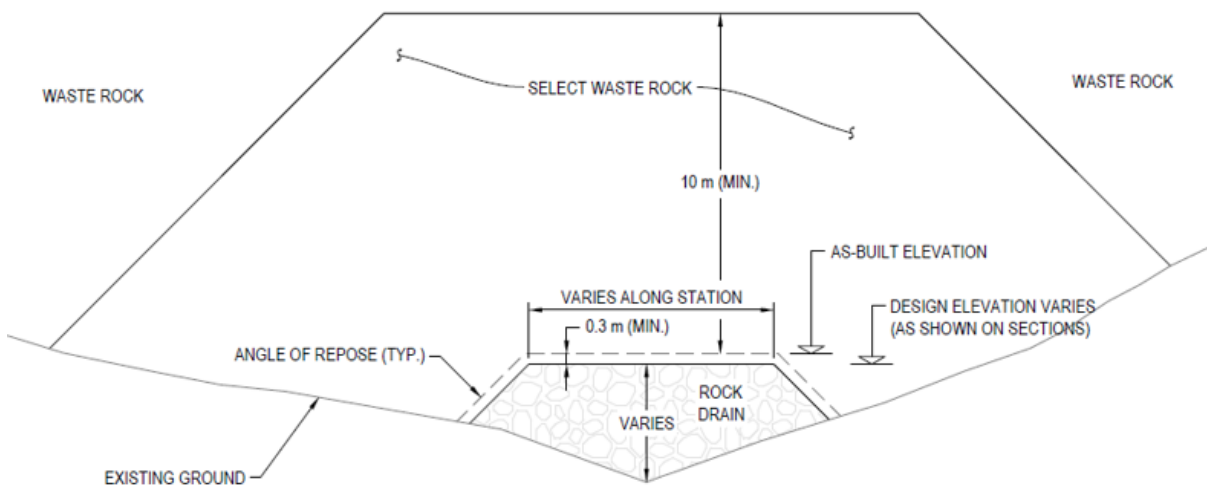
Typical Design Cross Section of Rock Drains
